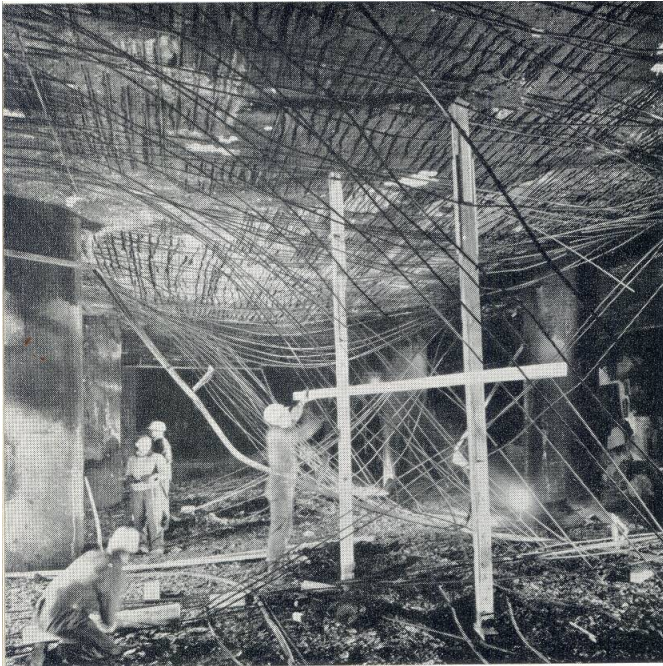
Severe damage by spalling, bottom reinforcement partly fallen down , reproduced from Lindblad et al. (1966)
